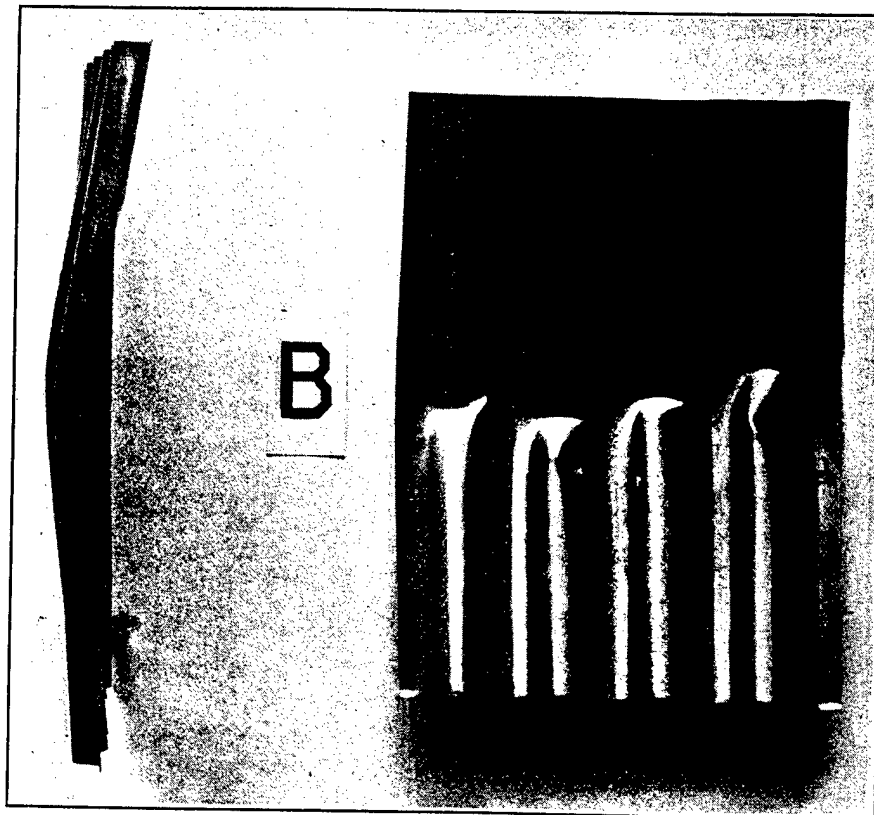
Column Failure of Corrugated Sheet.
